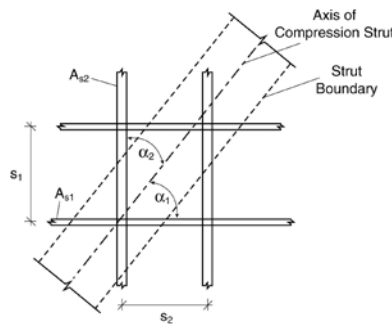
Layers of reinforcement to restrain splitting cracks of struts
